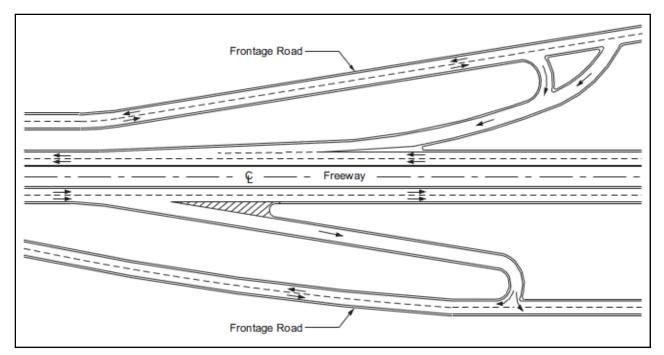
Intersections between ramps and two-way frontage roads (AASHTO 2011).
